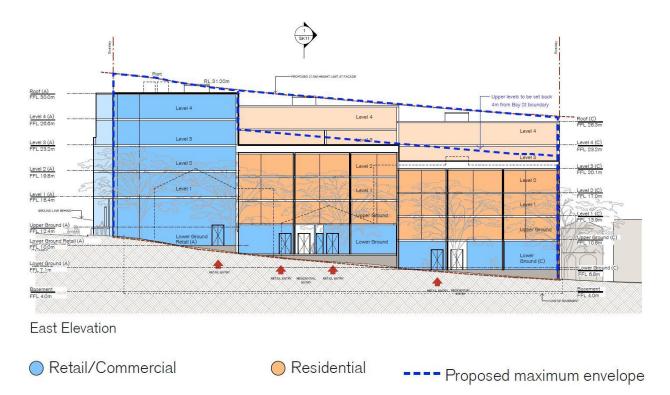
Development concept east elevation facing Bay Street (source: Tzannes)
